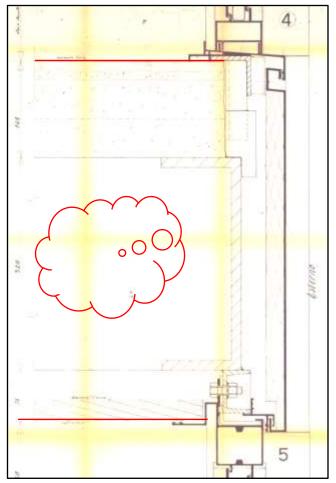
detail of the curtain wall window fixture, in the ceiling and floor in between there is air SOURCE: Fondo Domenico Morelli
